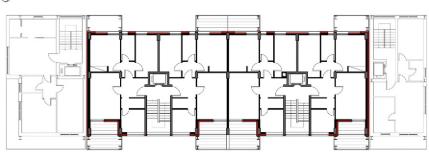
Plan type of the building block T7.* Renovation scenario considering wall insulation, window replacement, and addition of the external frame at the west and east side of the building creating new residential units.
